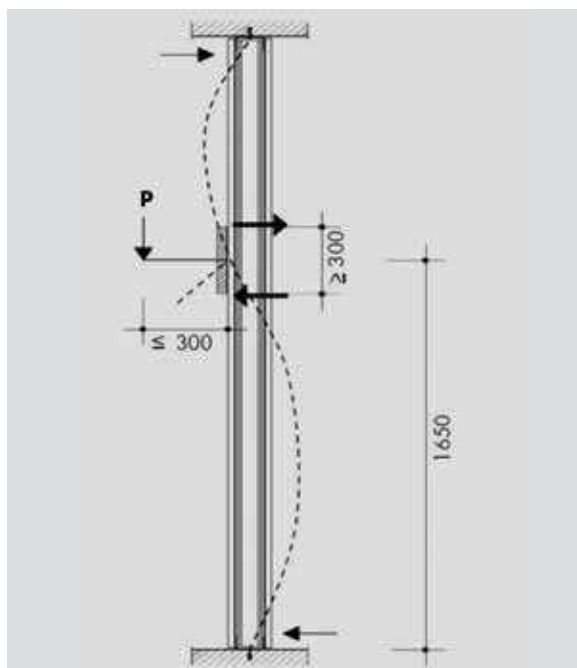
Installation loads anchored to partition walls designed as asymmetric cantilever loads
